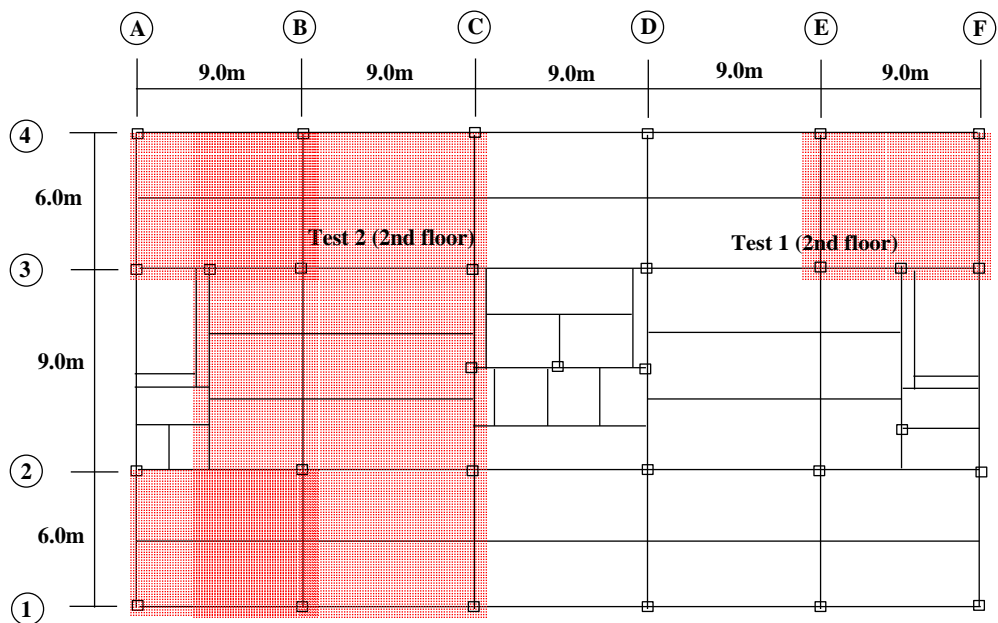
Plan view of the Cardington 8-storey frame showing the 2 BRE Tests
